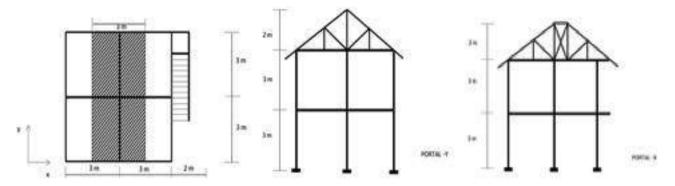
Design of coconut-timber house: (A). Floor Plan; (B). Portal Frame X-axis; and (C). Portal Frame Y-axis.
